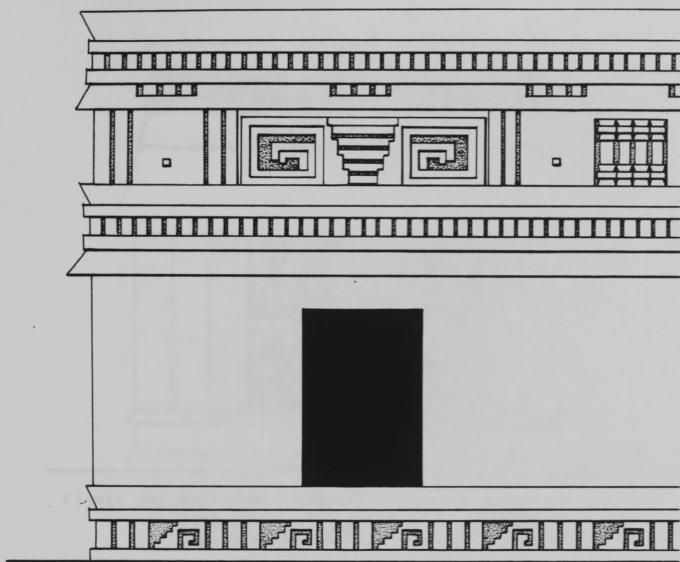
Chunhuhub, Structure 2. West facade, Room 1.
